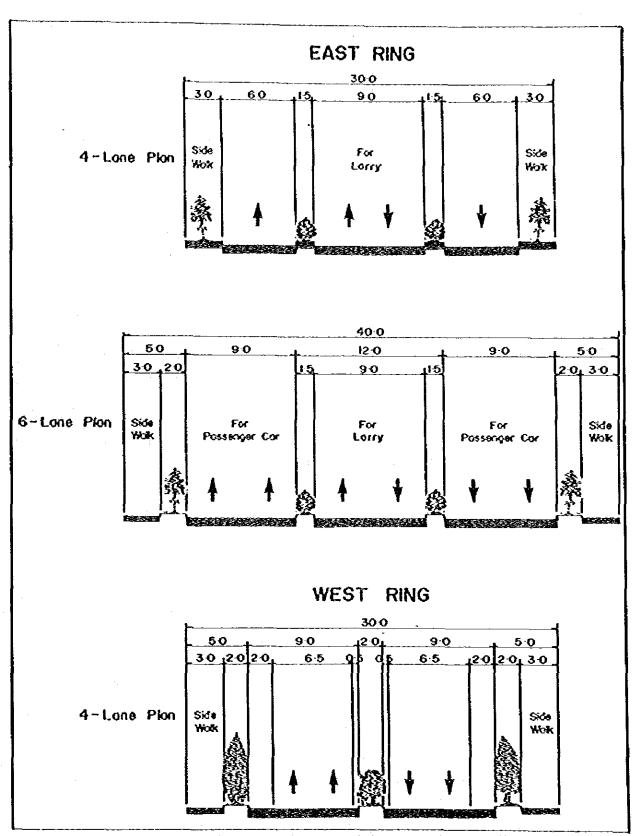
ALTERNATIVE CROSS SECTIONS EAST RING/WEST RING
